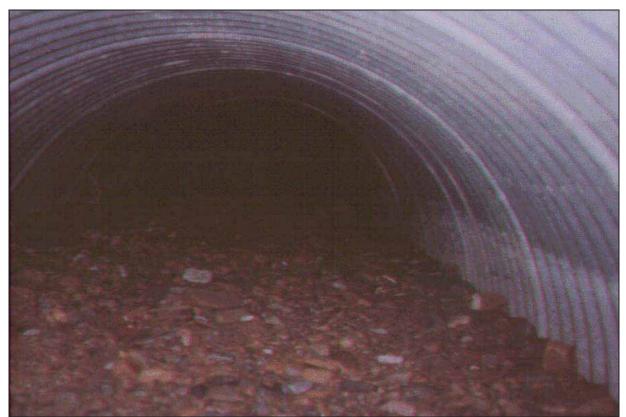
Photo. Culvert barrel filled with sediment up to half its rise, possibly due channel aggradation.⁽²⁾
